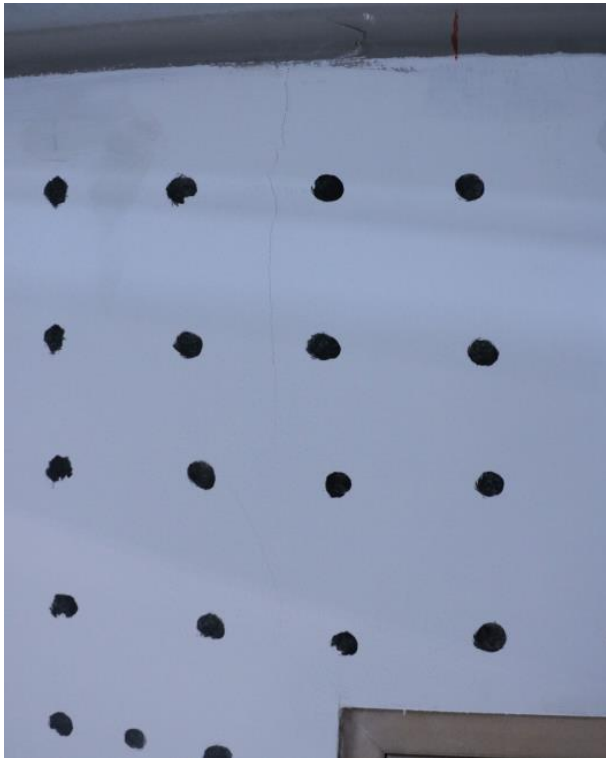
Specimen A3 – Step 7 – DS2: Wallboard Damage – location 4 (either side of doorway)
